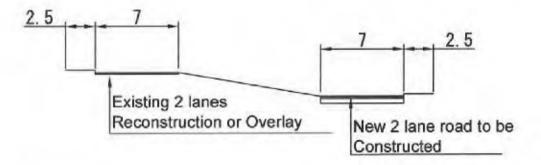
Typical Cross Section of Chipembere Highway (between Clock Tower to Chichiri RA) (All measurements in meters)
